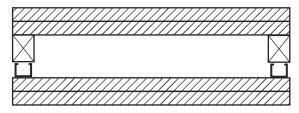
C7e: Two rows of 64 mm steel studs at 600 mm centres (Method 1)
